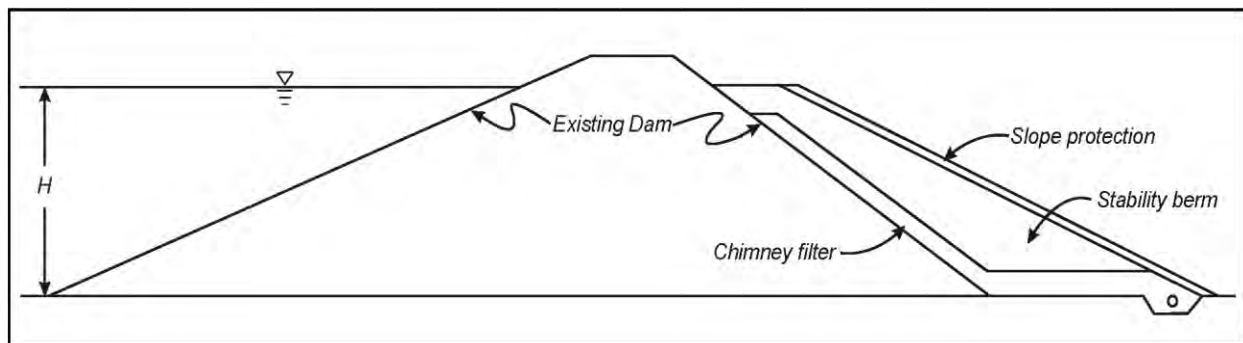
Simple cross section showing a chimney added to the downstream slope of an existing dam.
